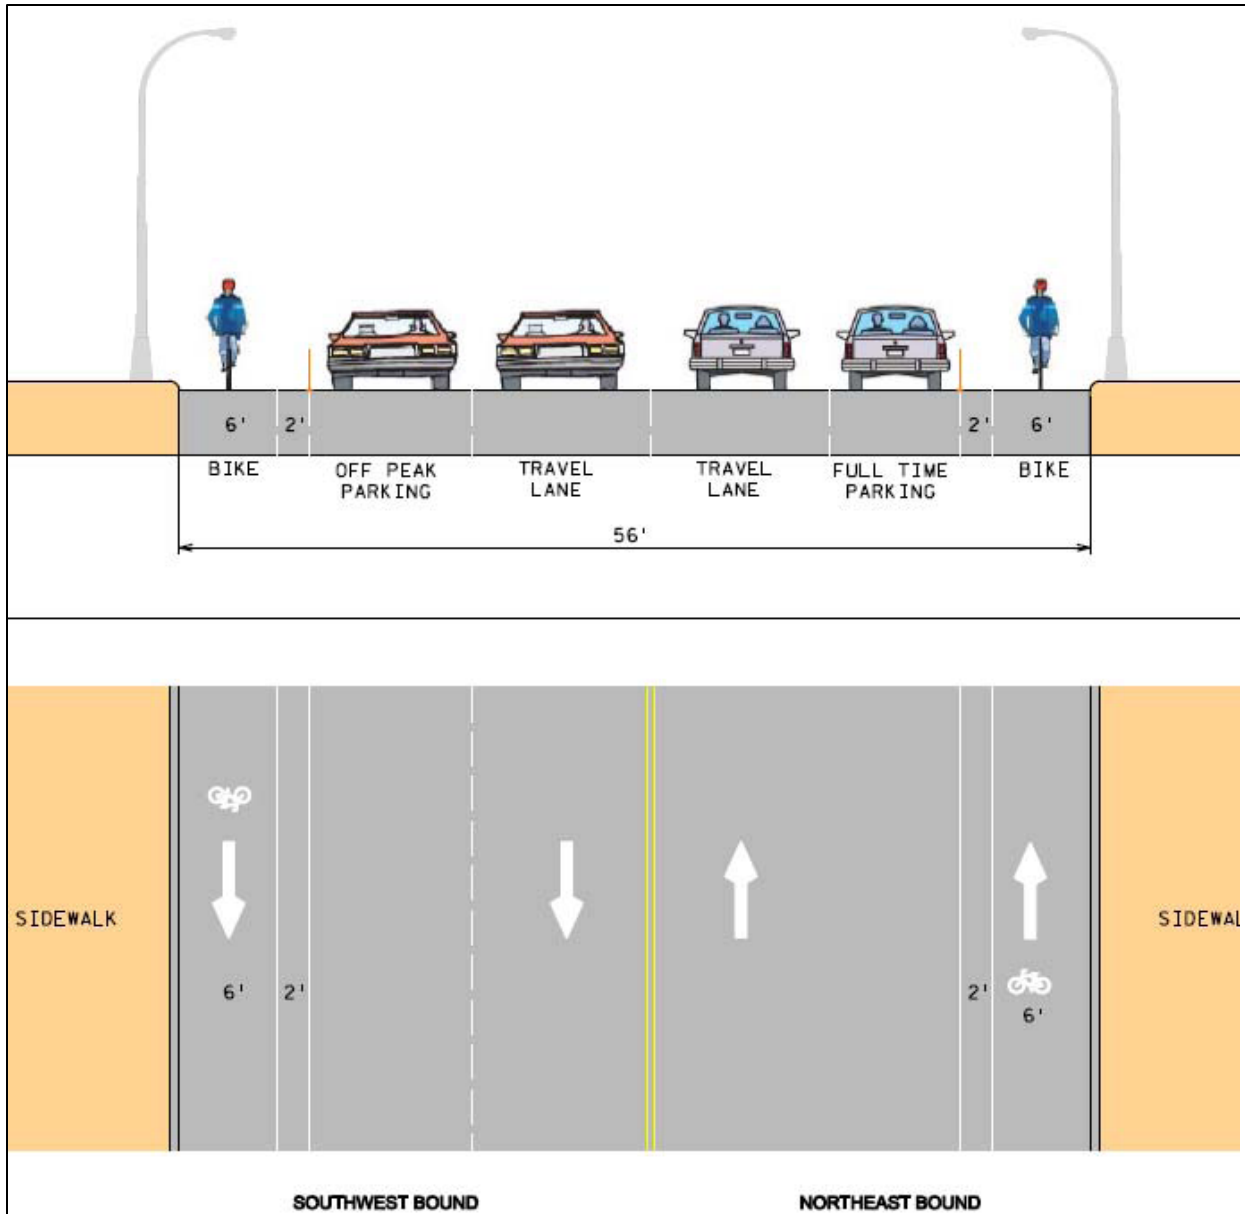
Example of 1st Avenue Proposed Cross-Section After Reconstruction
